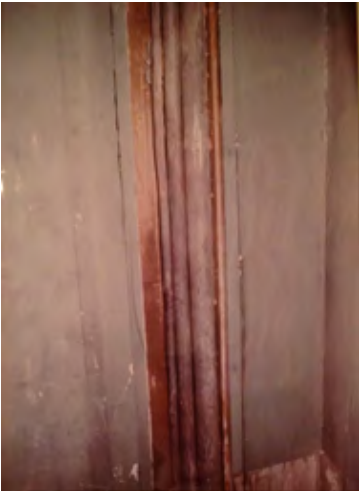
Photograph from 1976 depicting the shaft built into the north wall that contains lead water pipes.
